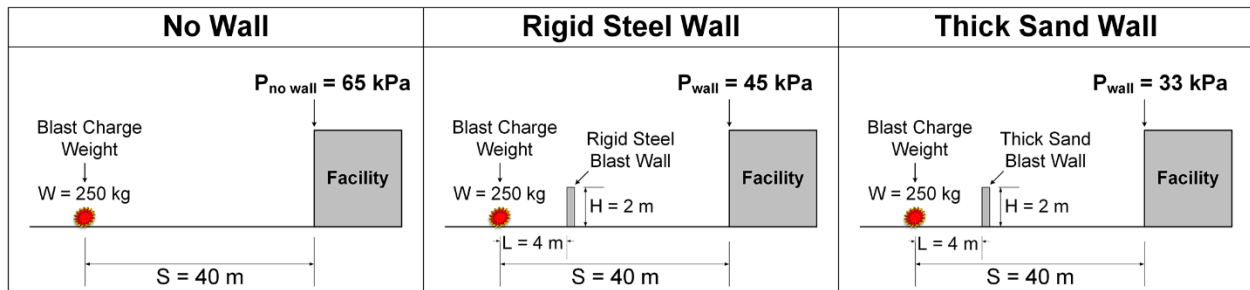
Impact of Blast Walls on Reflected Pressure at a Constructed Facility: (a) No Blast Wall; (b) Rigid Steel Blast Wall; (c) Thick Sand Blast Wall
